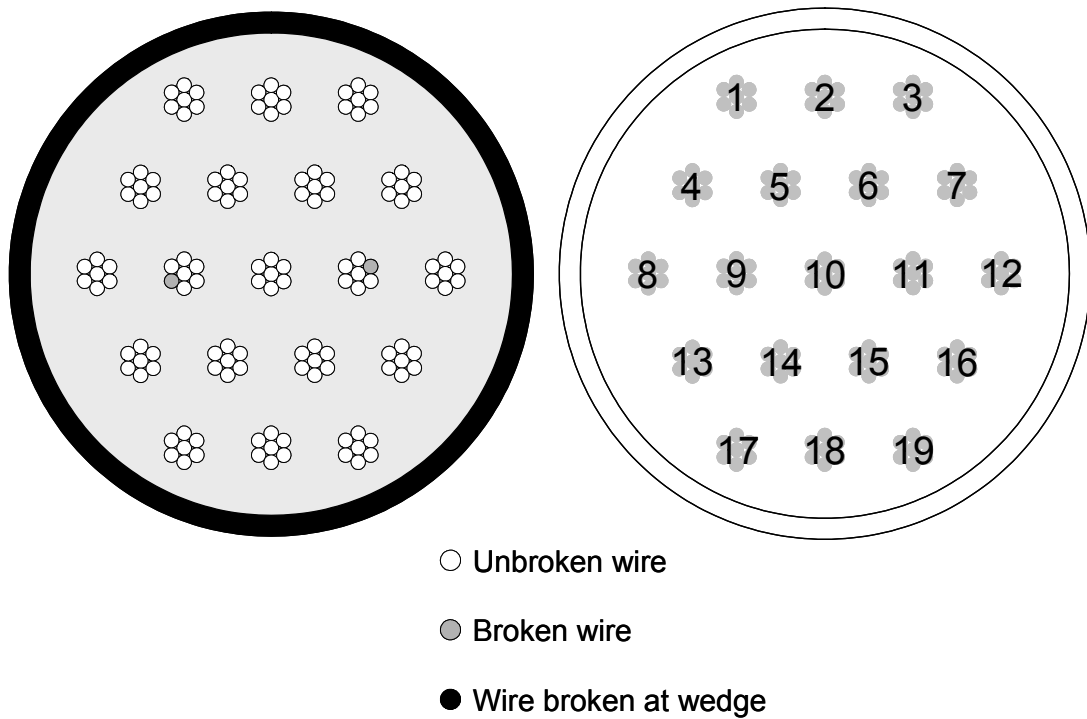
Wire breaks at deck anchorage - Specimen 8
